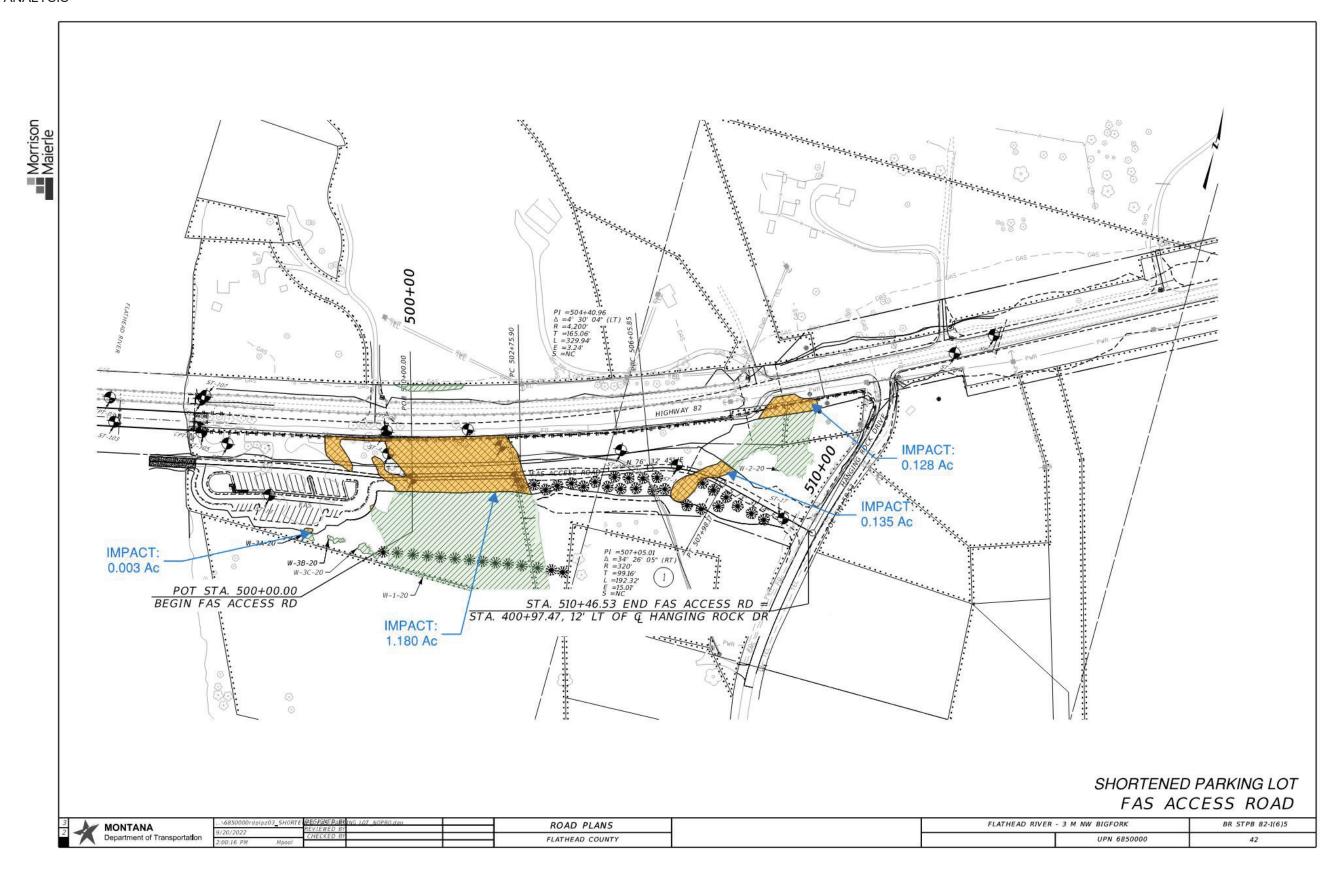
Shortened FAS Parking Lot (Proposed Action)
